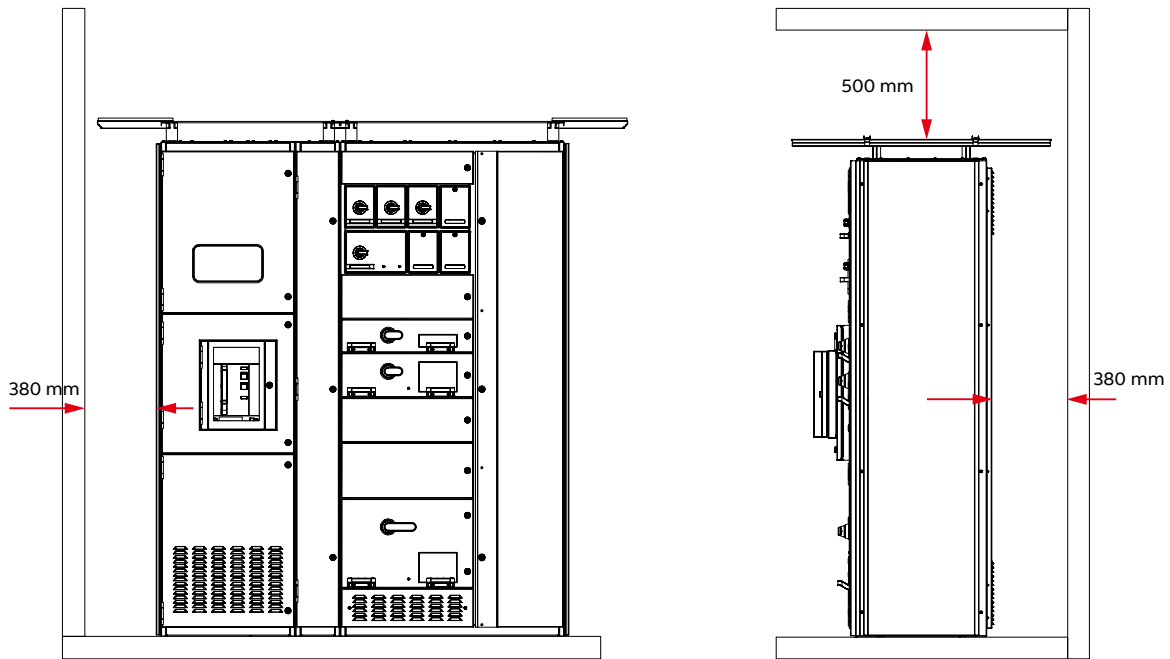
Section minimum clearances for raised roof plate IP43 with left mounted doors
